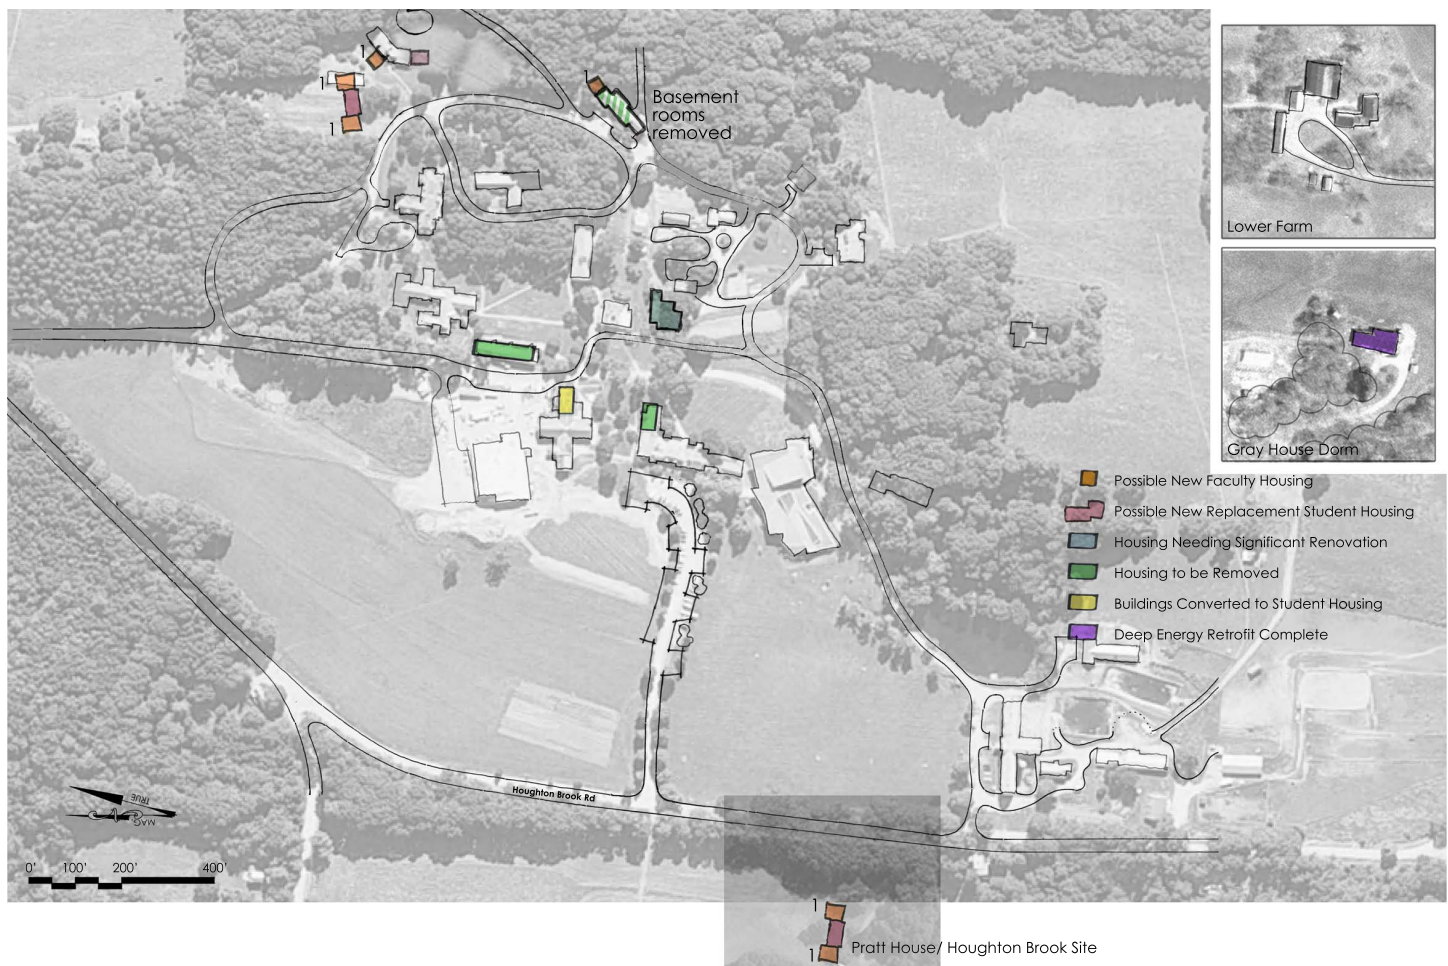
Recommended Locations for New Dorms and Renovations of Existing Dorms
